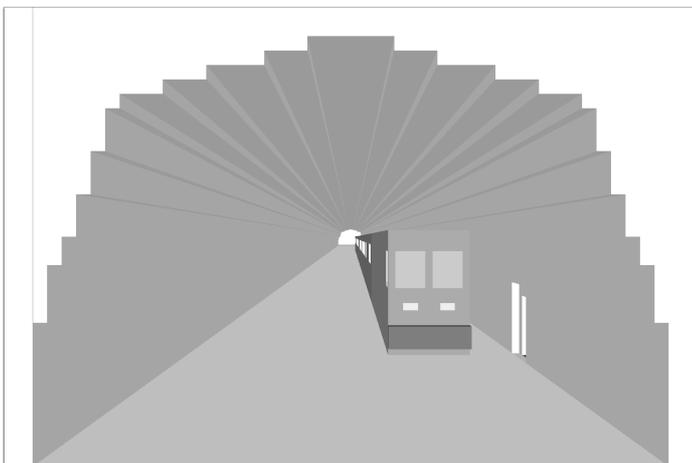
Simplified cross-section of bi-directional tunnel tube
